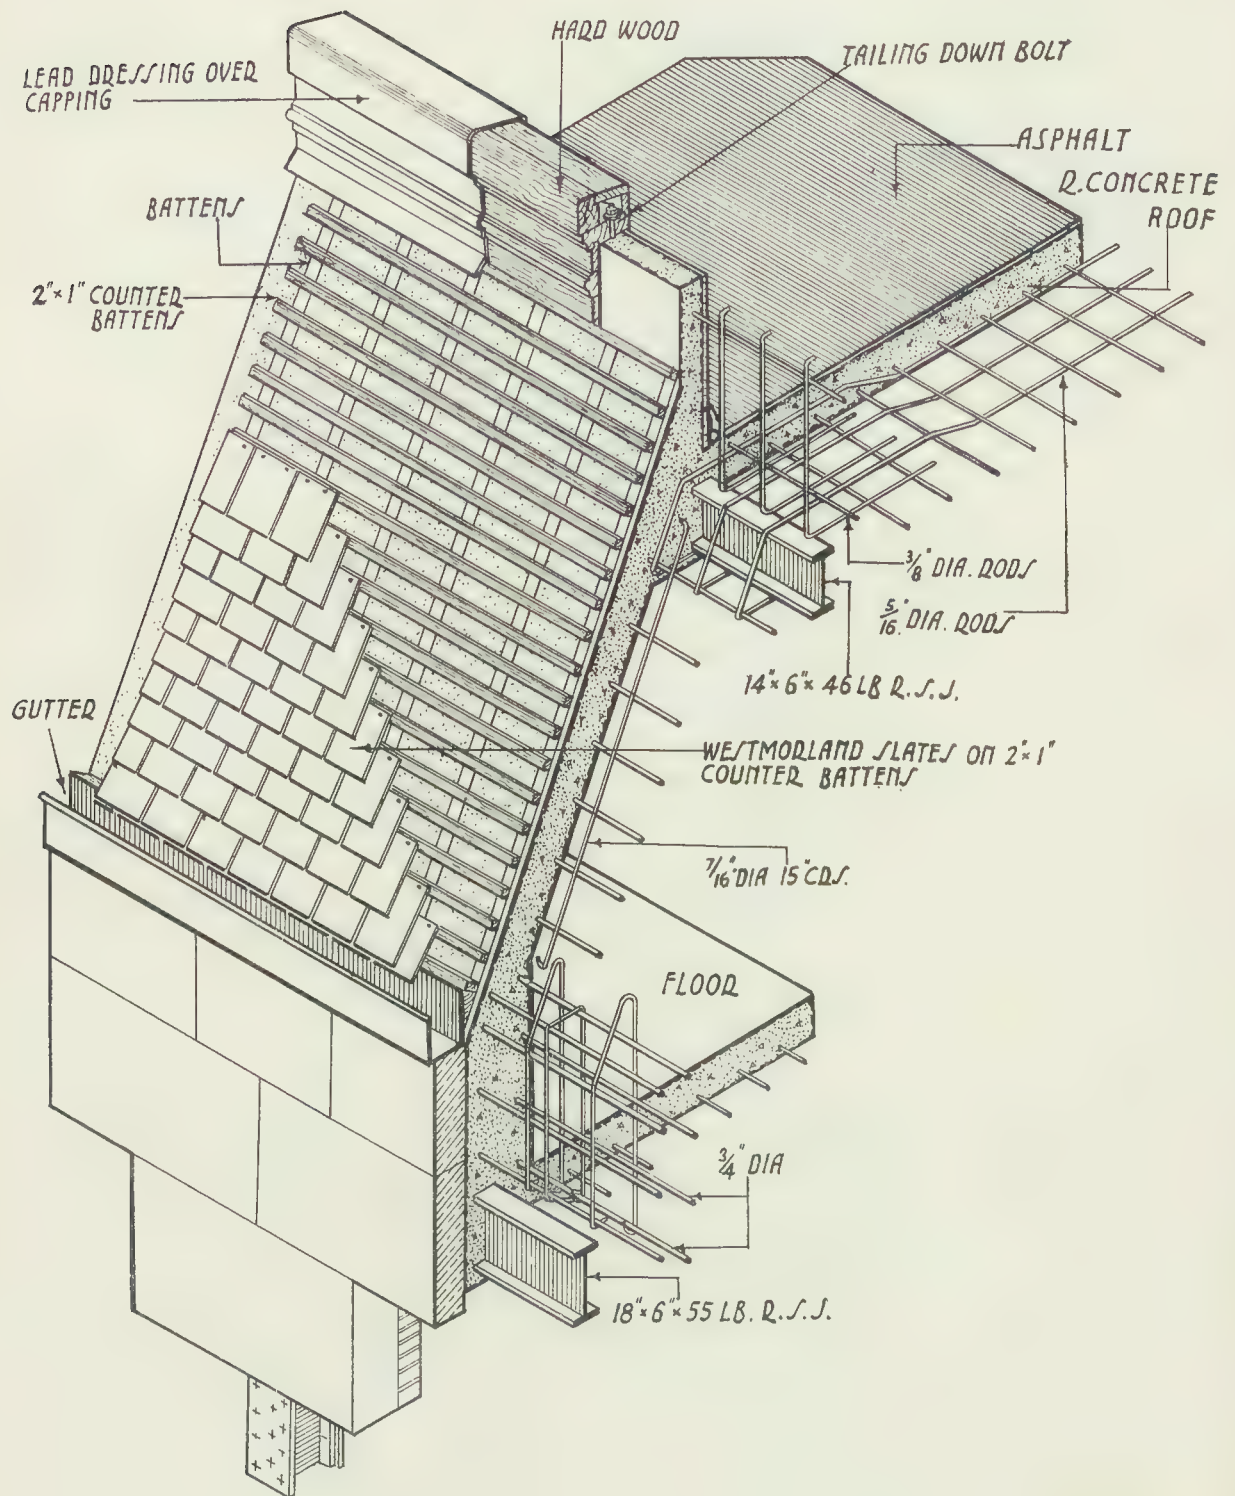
CONSTRUCTION OF REINFORCED CONCRETE "DECK" ROOF SHOWING ROOF FINISHINGS
